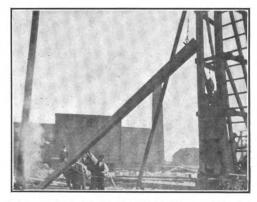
Pile Being Pulled Into Place, the Hammer Being Down to Steady Machine.
